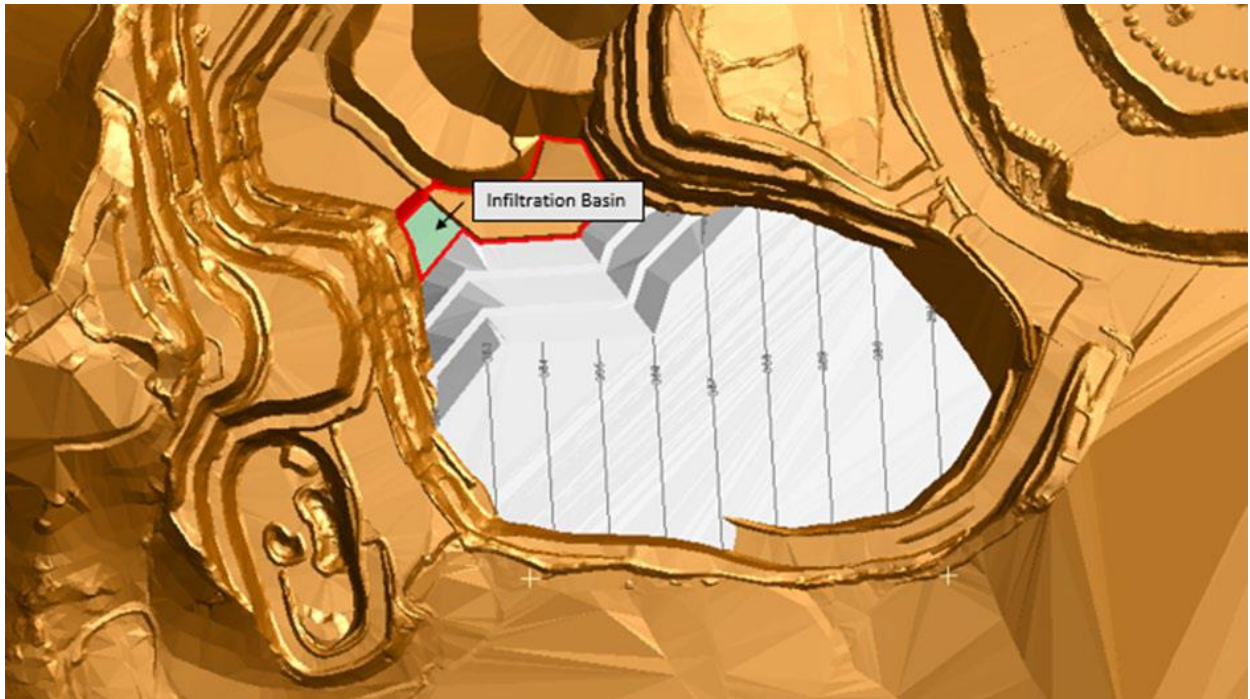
Site Layout Plan – completed tailings deposition in C Pit with surface contours (figure provided as part of the amendment application)
